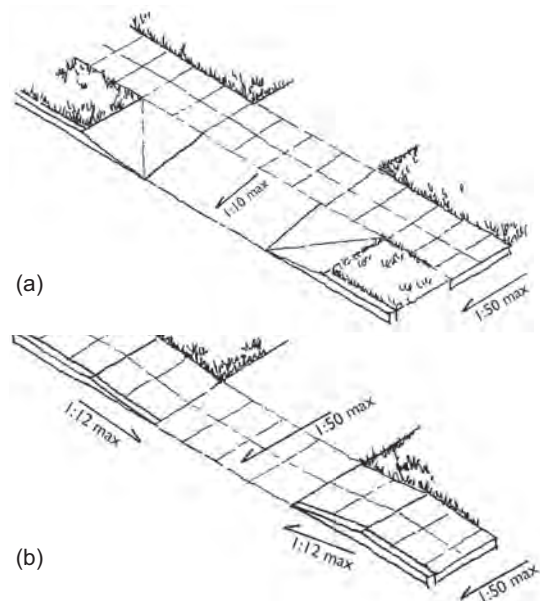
A.13 a and b: Figure a (top) is a preferred design for driveways where the sidewalk passes straight and level indicating the primacy of pedestrians. Where sidewalk widths are constrained, the design shown in Figure b (bottom) can be used.
